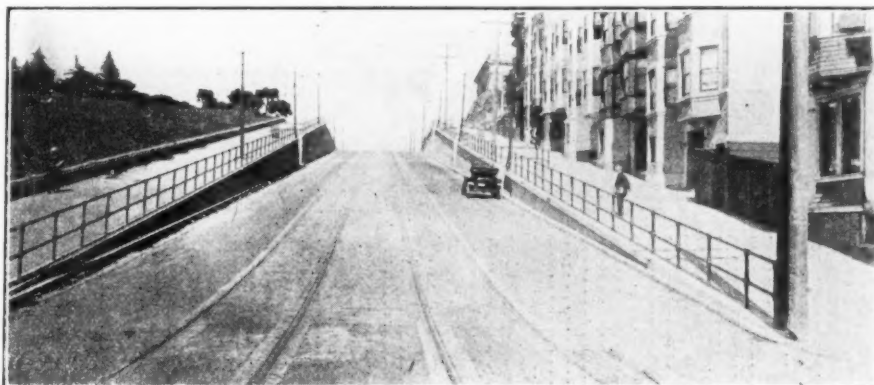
ROADWAY LOWERED WITHOUT LOWERING SIDEWALKS.
